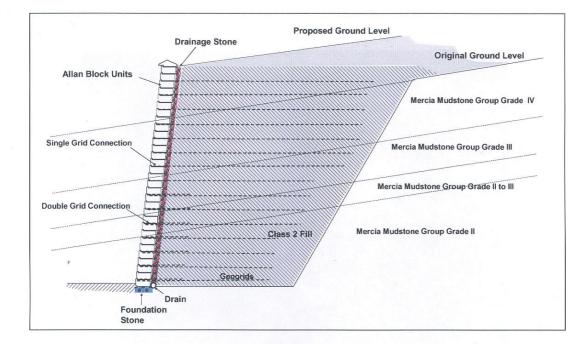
A typical section through the site showing the geological model and typical reinforced earth wall layout.
